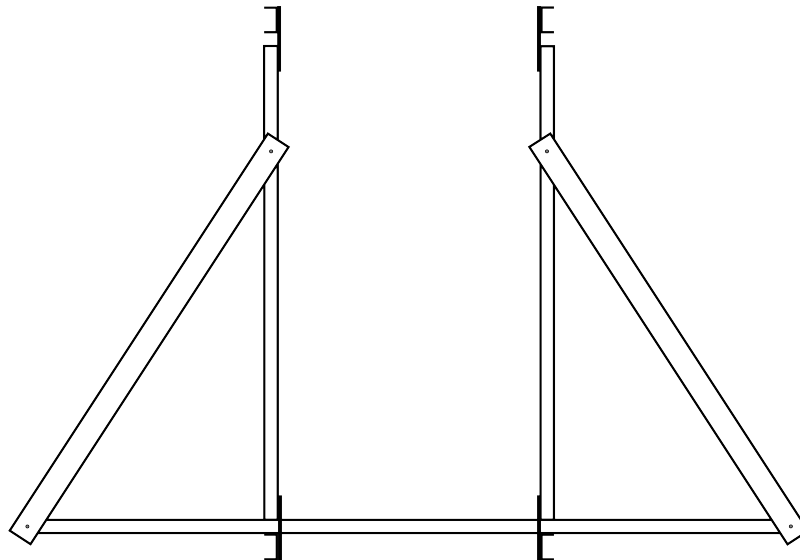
First iteration of the structure stabilising the trusses against out of plane forces.
